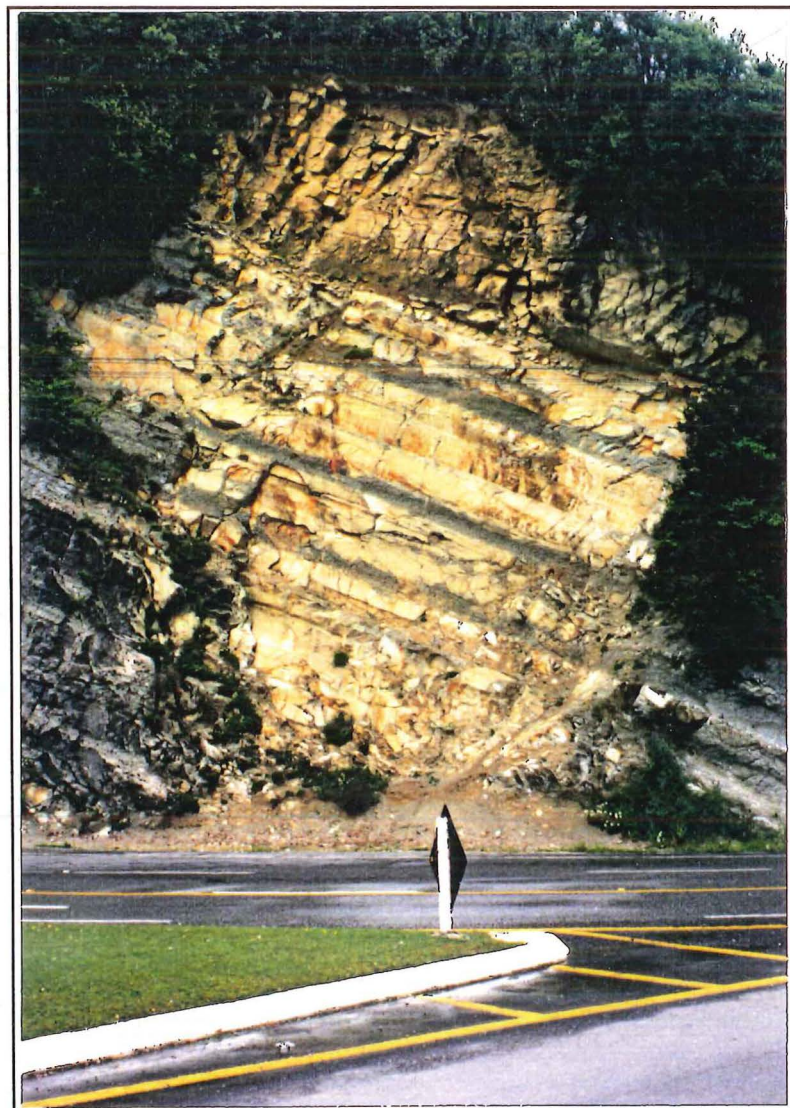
A large rock fall involving Cobden Limestone that has occurred at the Greymouth side of the Cobden Bridge. Note jointing within the limestone and iron stained joint faces. The prominent joint trending parallel to the orientation of the photograph is the F1 joint identified during rock mass characterisation.
